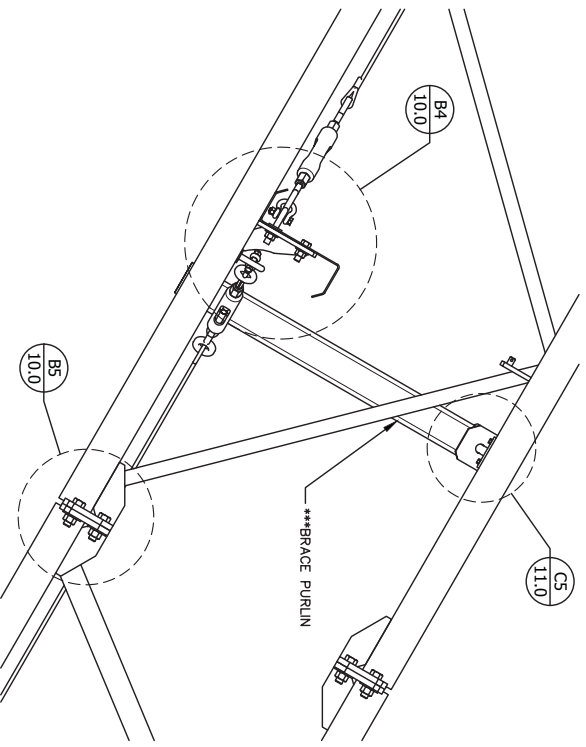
70'-80' VP PEAK INSERT (RIDGE VENT)
